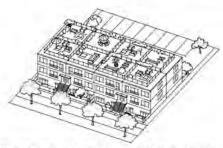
Illustration of courtyard arrangement of stacked townhouses or rowhouses
